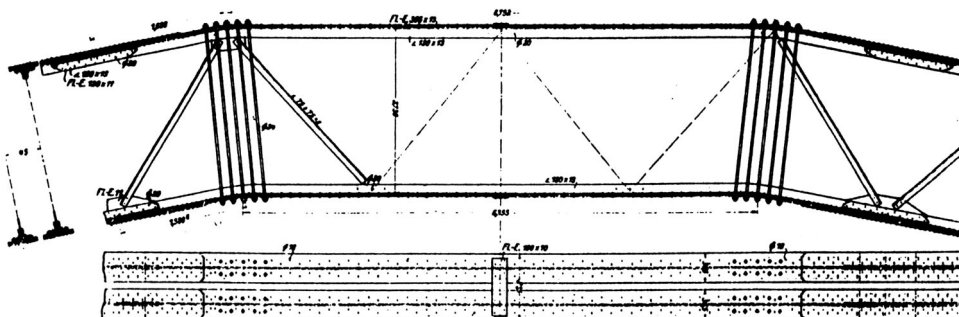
Horizontal steel trusses – reinforcement of the tensioned ring
